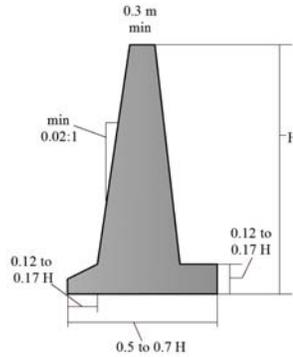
Initial Dimensions for Gravity Retaining Wall (Das 2011)
